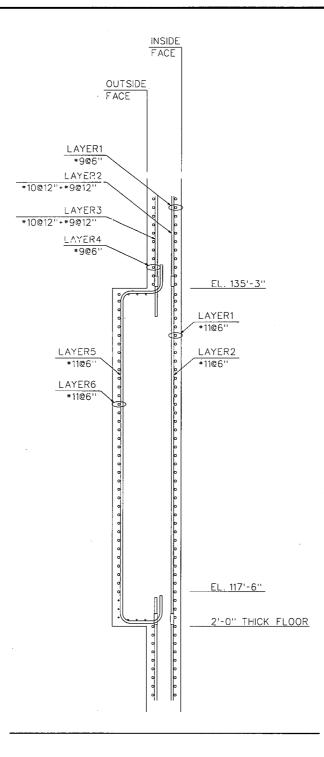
Concrete Reinforcement in Wall 11 (Sheet 2 of 3)
